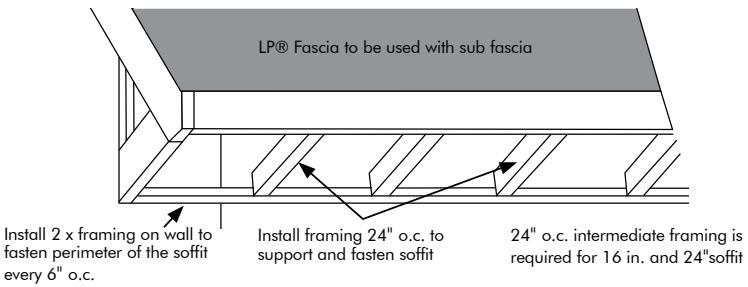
12 IN. CUT TO WIDTH SOFFIT NAILING DIAGRAM
